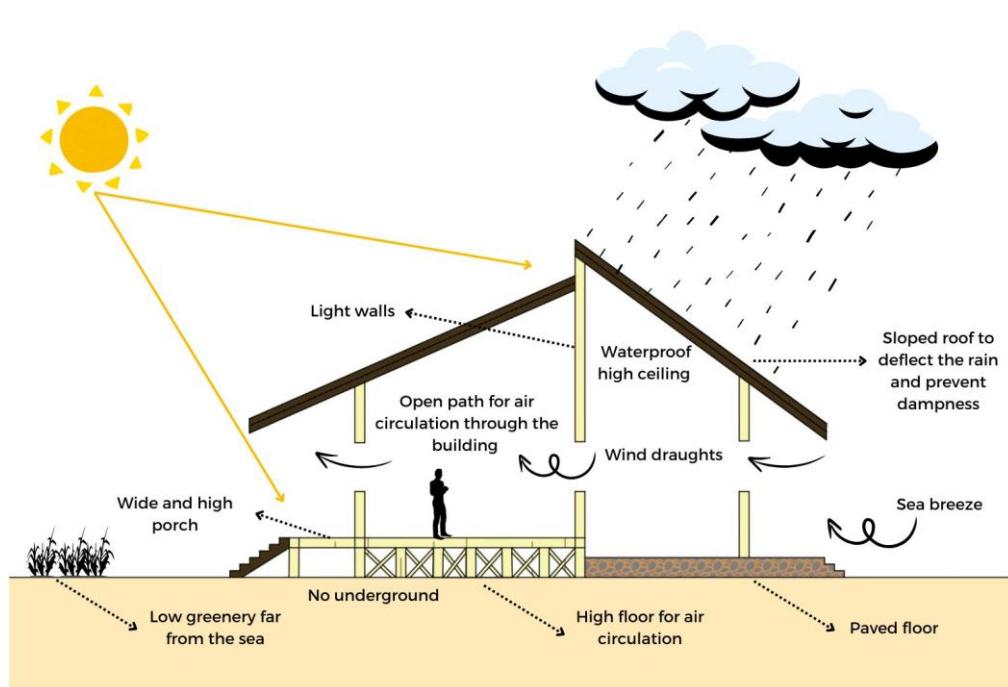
Traditional house form in Rasht. (Source: Authors, 2024)
